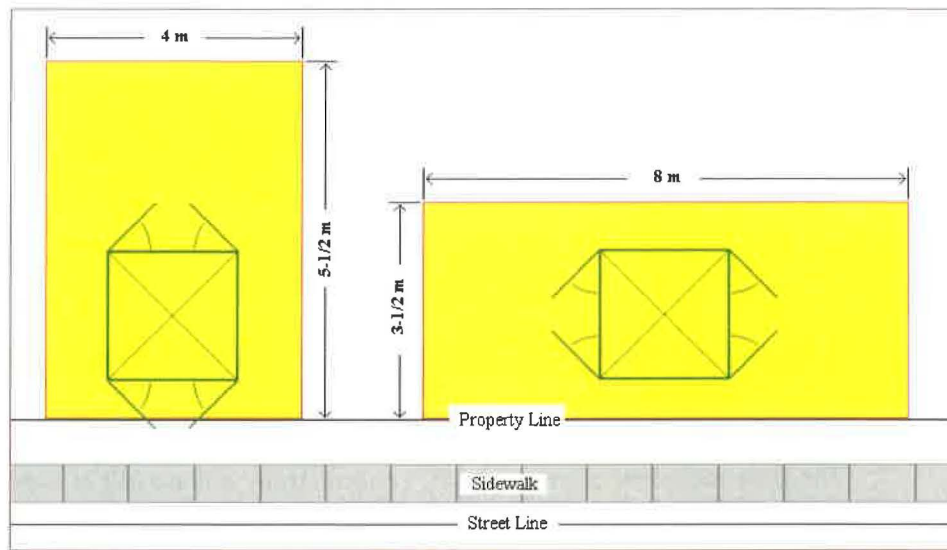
, Minimum Easement Dimensions for Padmounted Switching Enclosure
